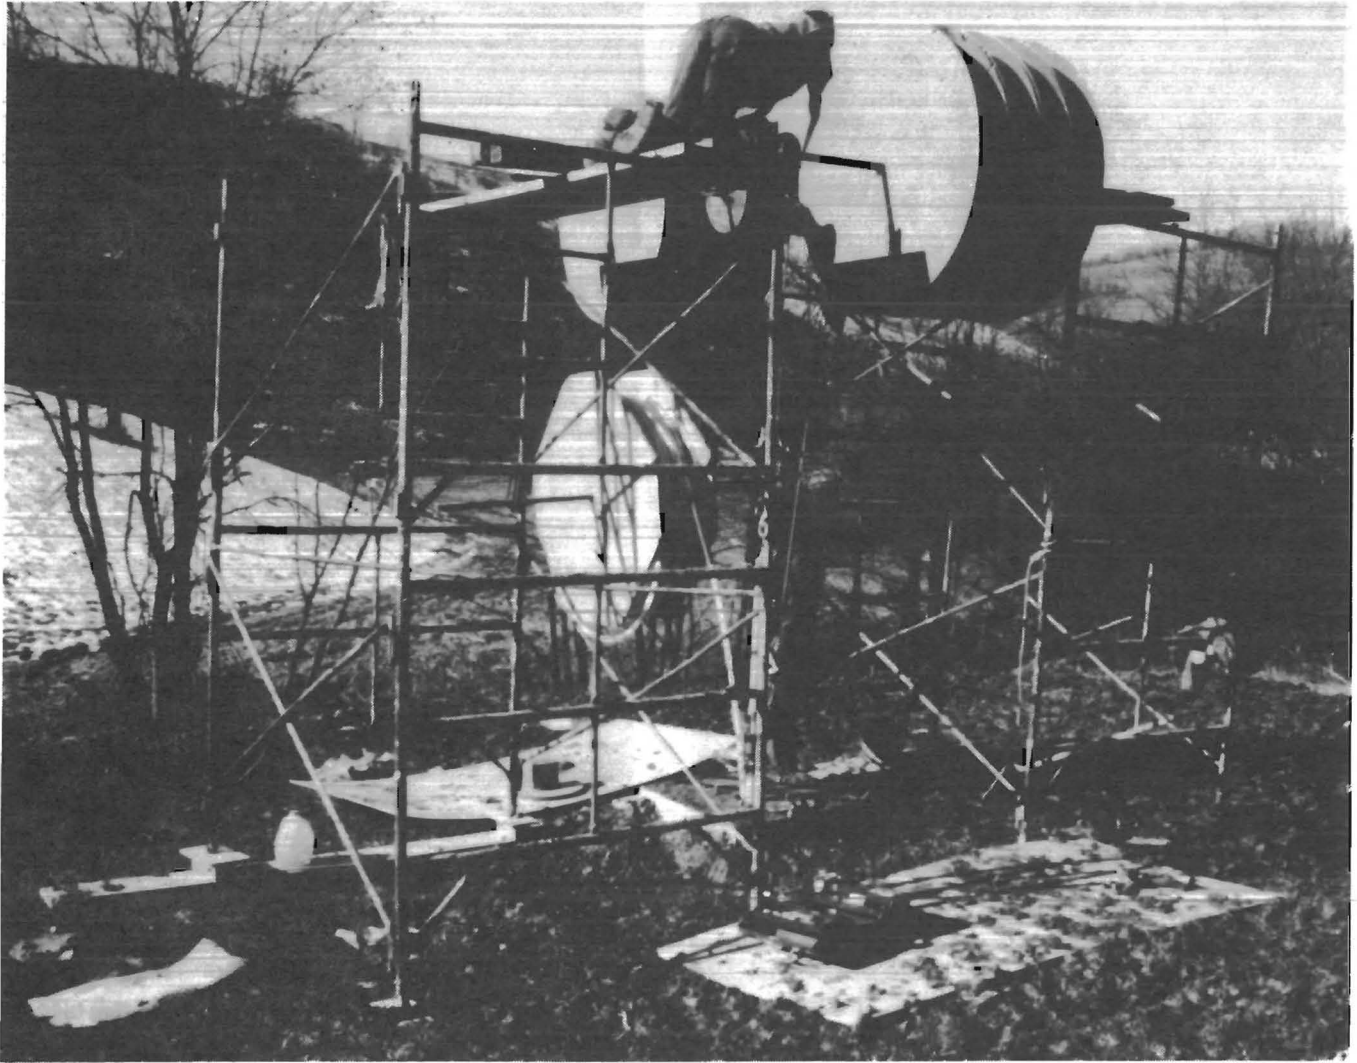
Instrument installation apparatus with mounted grout tube and extensometer anchor wire-tubing assemblies.
